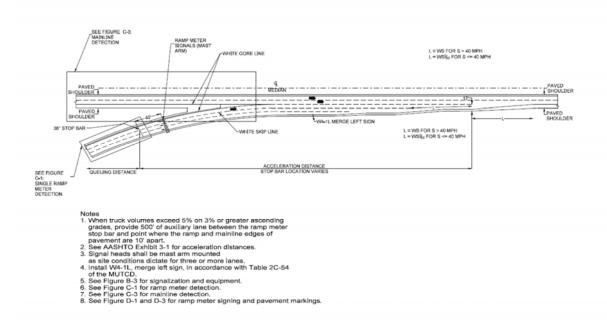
Single Lane Ramp Meter with Transit Bypass Overview
